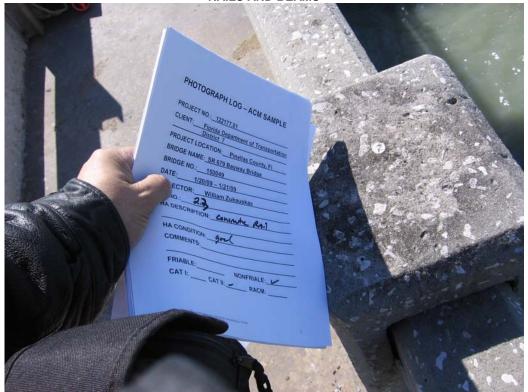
01/21/09 - SAMPLE 2.3 - HA 2 CONCRETE RAILS AND BEAMS
